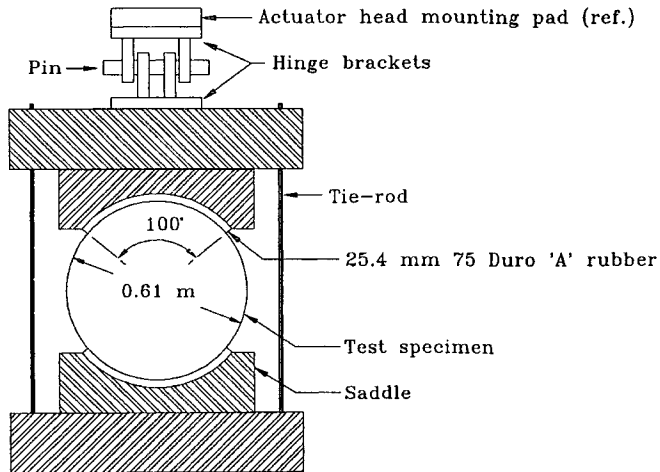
CROSS-SECTION OF LOADING APPARATUS USED FOR PILE SHAFT TEST UNITS PS7-PS10
